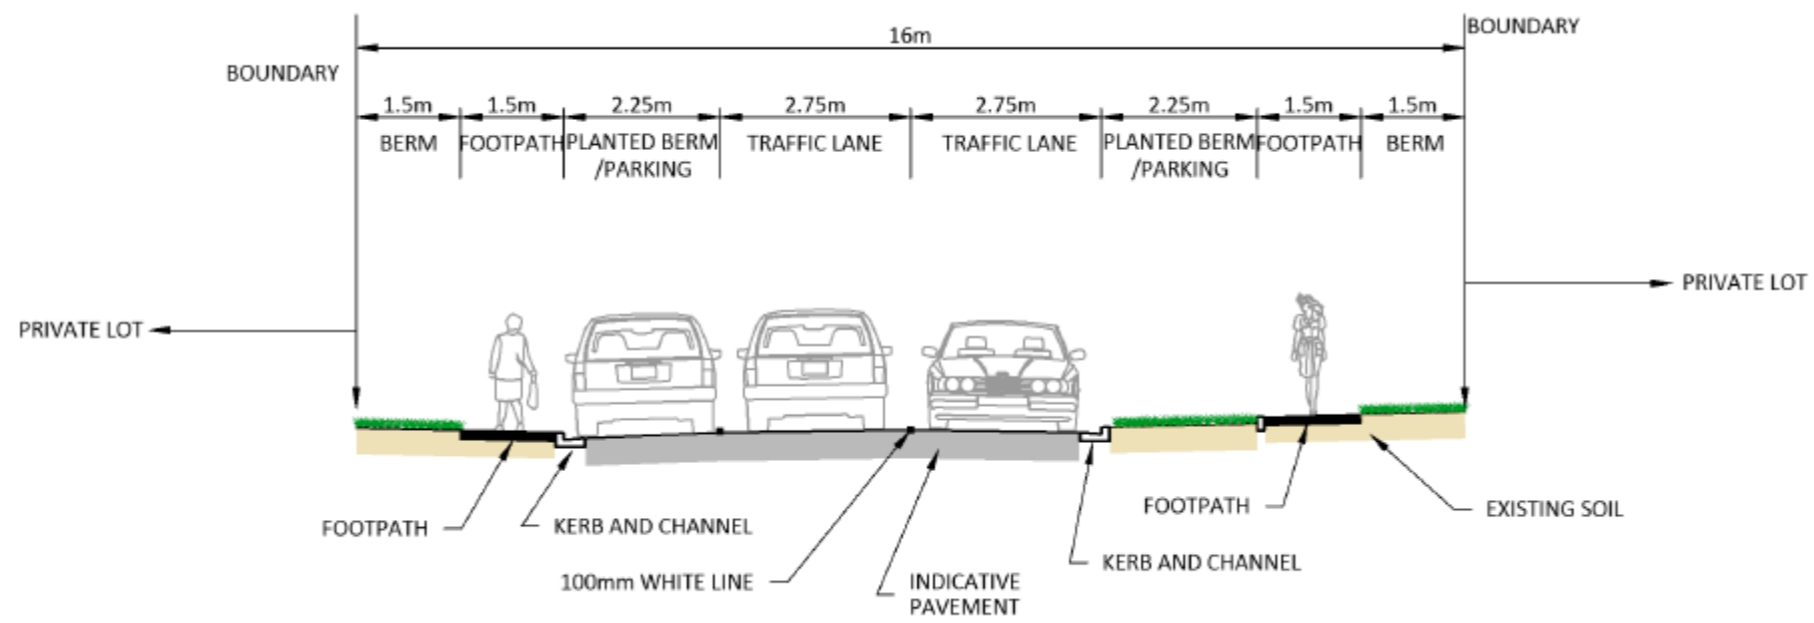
Ohinewai Structure Plan - Road cross sections – Local Roads (Residential Roads)
